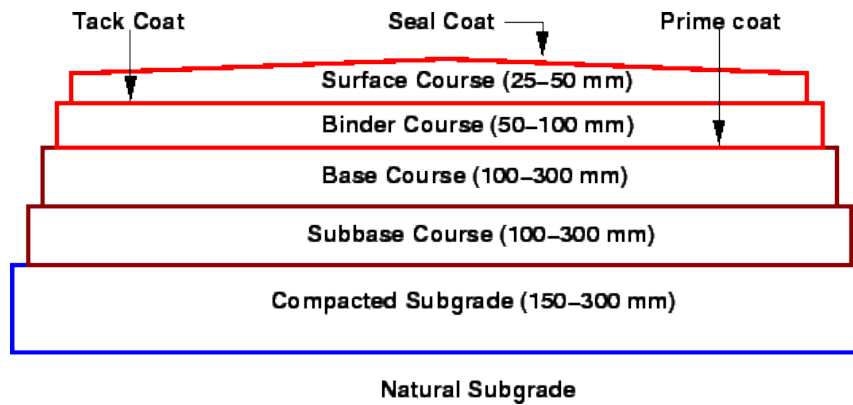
Typical cross section of a flexible pavement (Mathew, 2009)
